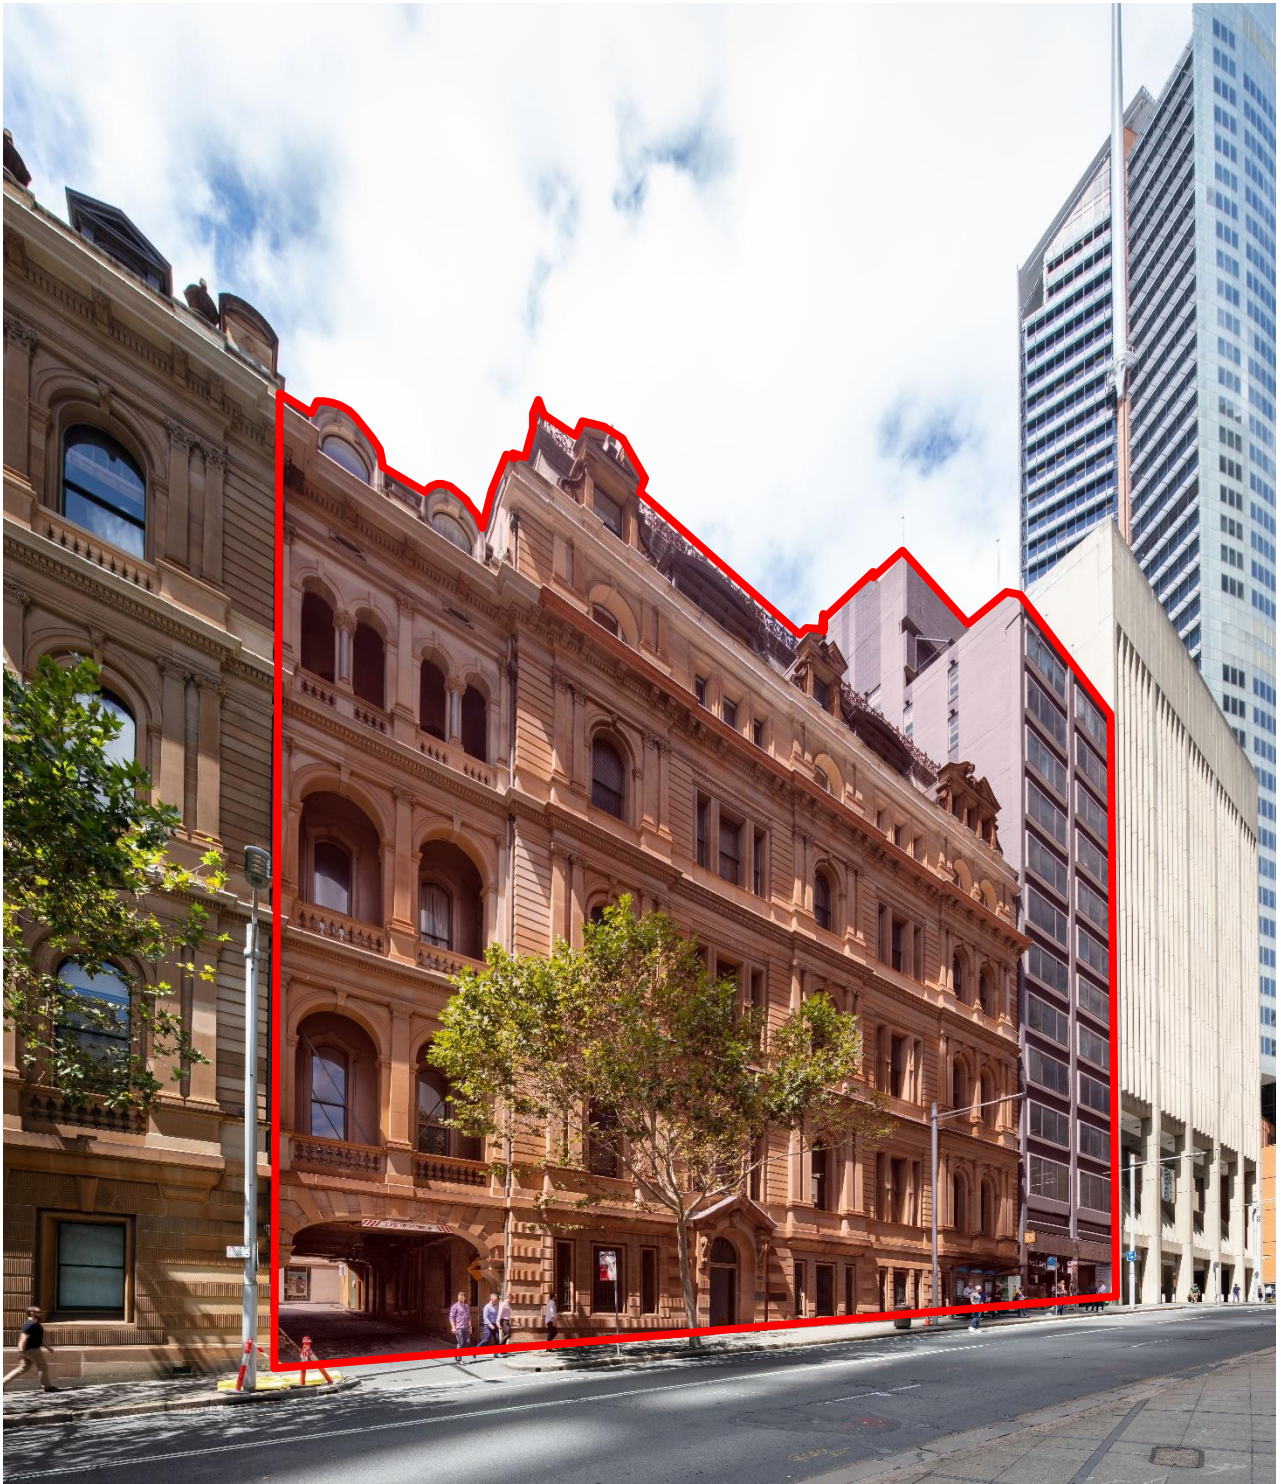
Existing Building Fronting Phillip Street - Source: Built
